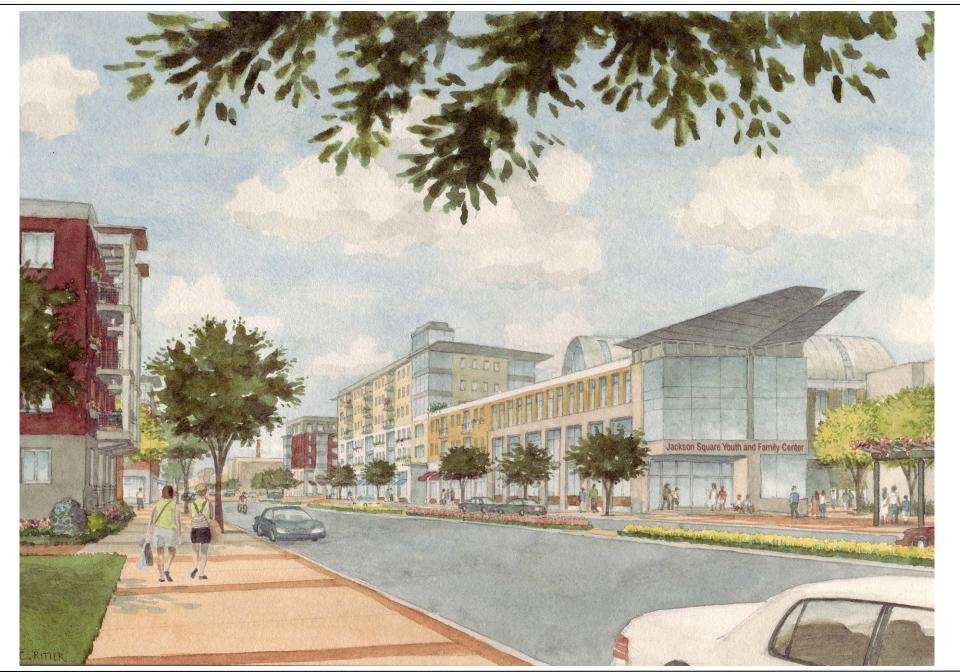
Columbus Avenue Looking Southwest at Site I Jackson Square Boston, Massachusetts
